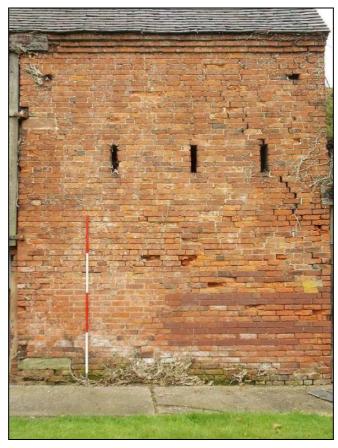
Northern bay of the east elevation, looking west (scale 2m).
